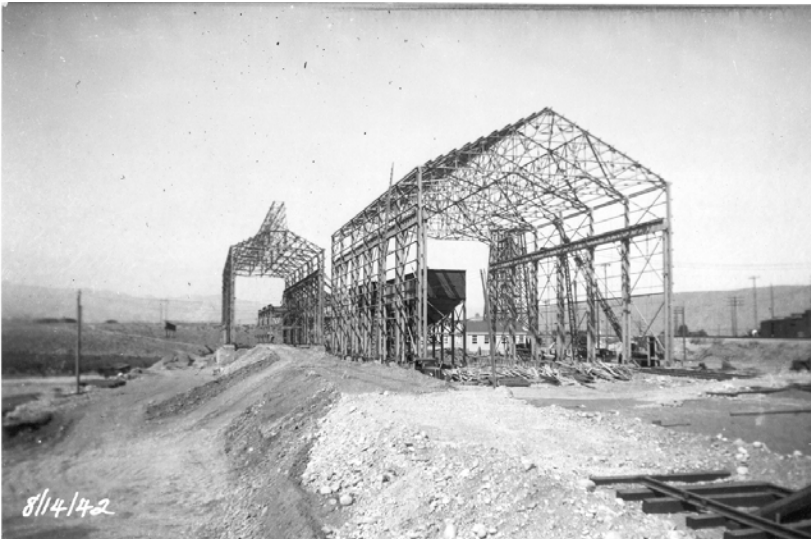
Smelter under construction, 1942. (Big Bend Railroad History)
